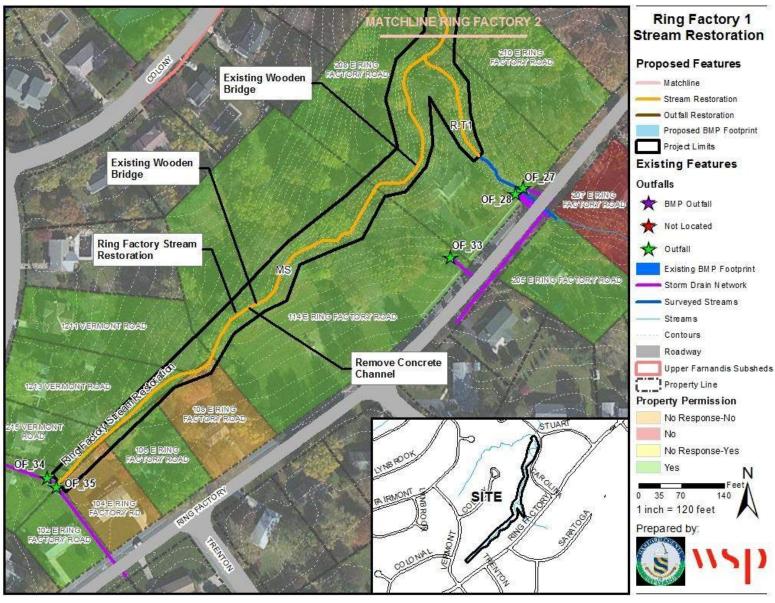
Site Location and Proposed Project Plan for Ring Factory Upstream Stream Restoration Segment (Sheet 1 of 2)
